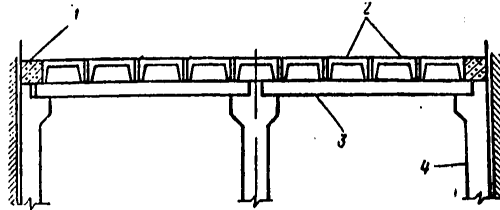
Arrangement of monolithic collar beam in precast overhead cover
